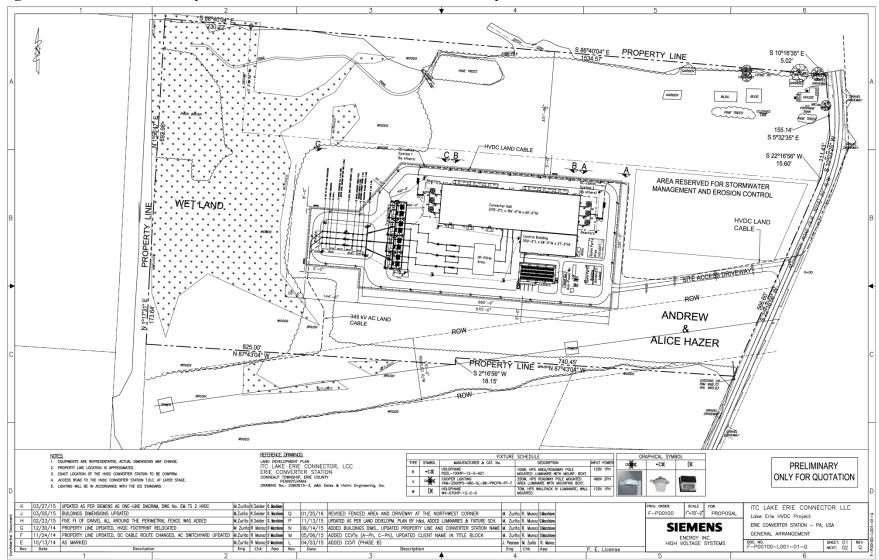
Preliminary Erie Converter Station site location and layout
